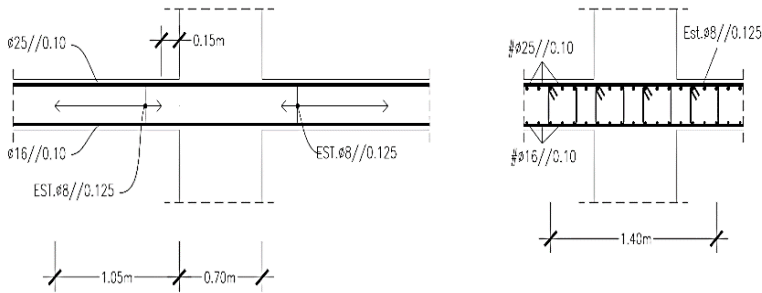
Cross-section of the transverse reinforcement detailing. Left: Longitudinal; Right: Transversal.
